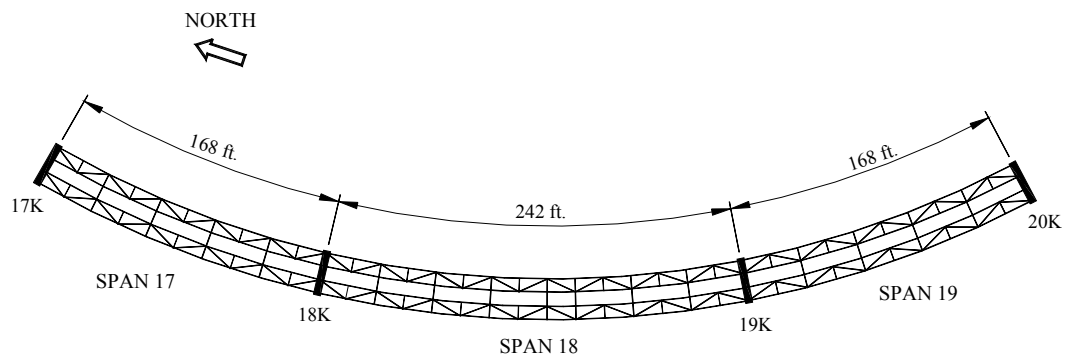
PLAN VIEW FOR BRIDGE (CHEPLAK, 2001)
